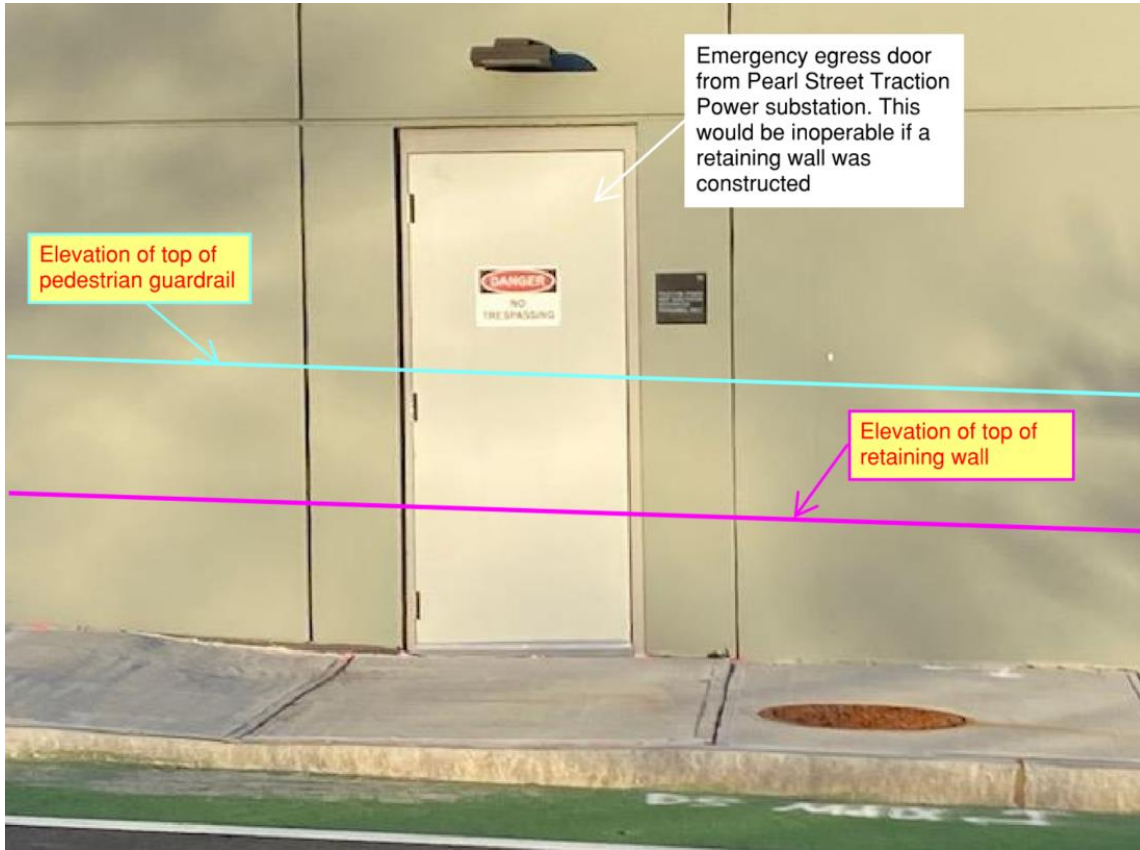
Medford Street facing the MBTA PSTPSS emergency egress door
